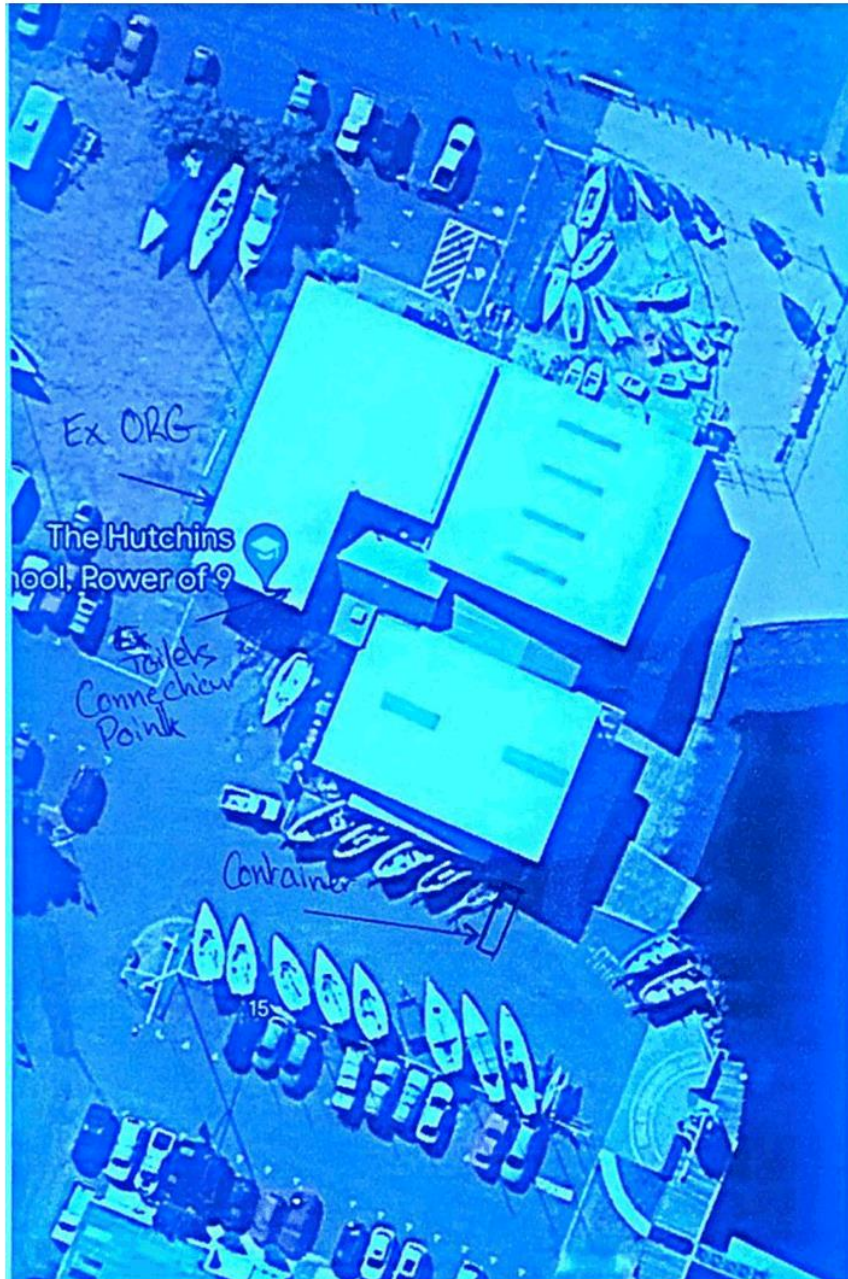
above: submitted site plan showing position of proposed container(new building for food service use).
